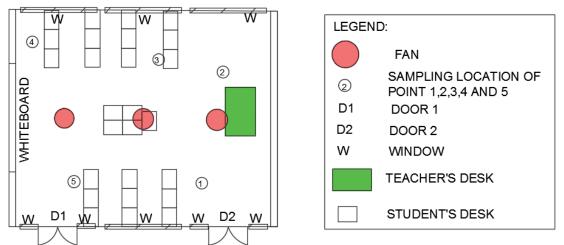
Floor plan at Level 2 of SK Bayan Lepas
